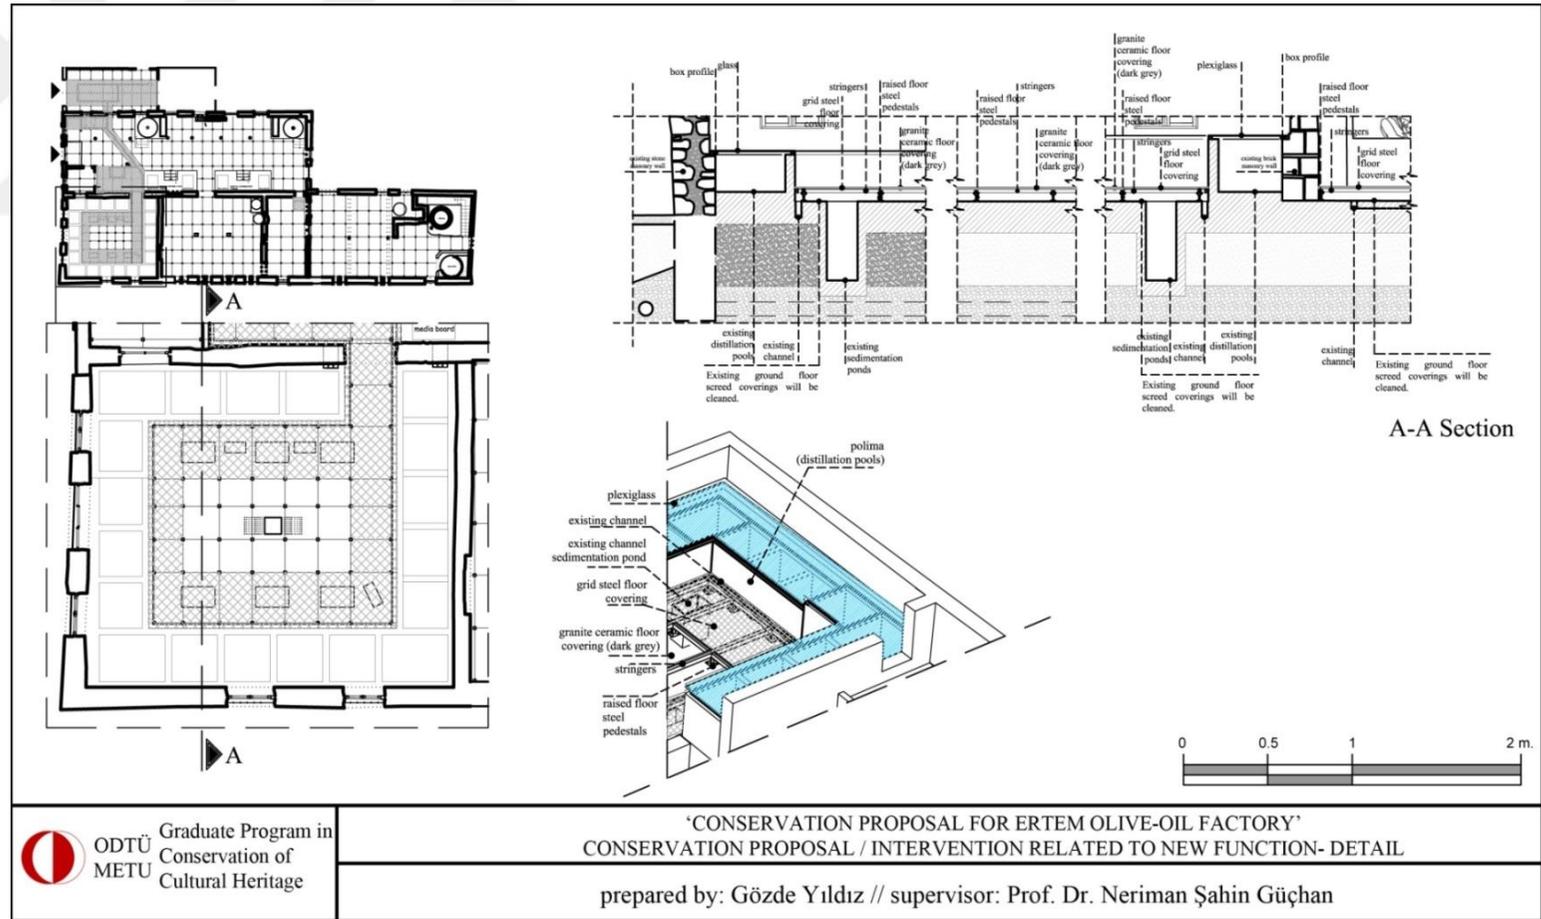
Conservation Proposal, new implementation, detail for the ground floor, N-D1
